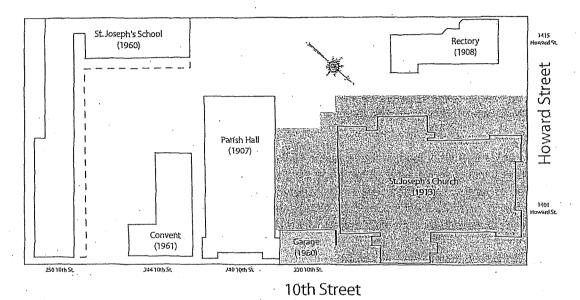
Site plan of the former St. Joseph's Church complex. The parcel on which the church is located (APN 3517/035) is shown in red. The rectory, parish hall, convent, and school buildings are no longer associated with St. Joseph's Church. The garage has since been demolished, and the parcel (APN 3517/036) is now associated with the subject building, shown in blue.
